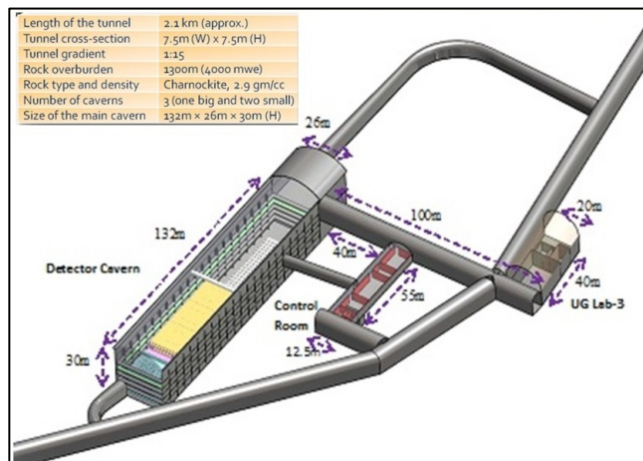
The plan layout of underground laboratory of INO project at Theni, Tamil Nadu (Source B. Satyanarayana, TIFR)
